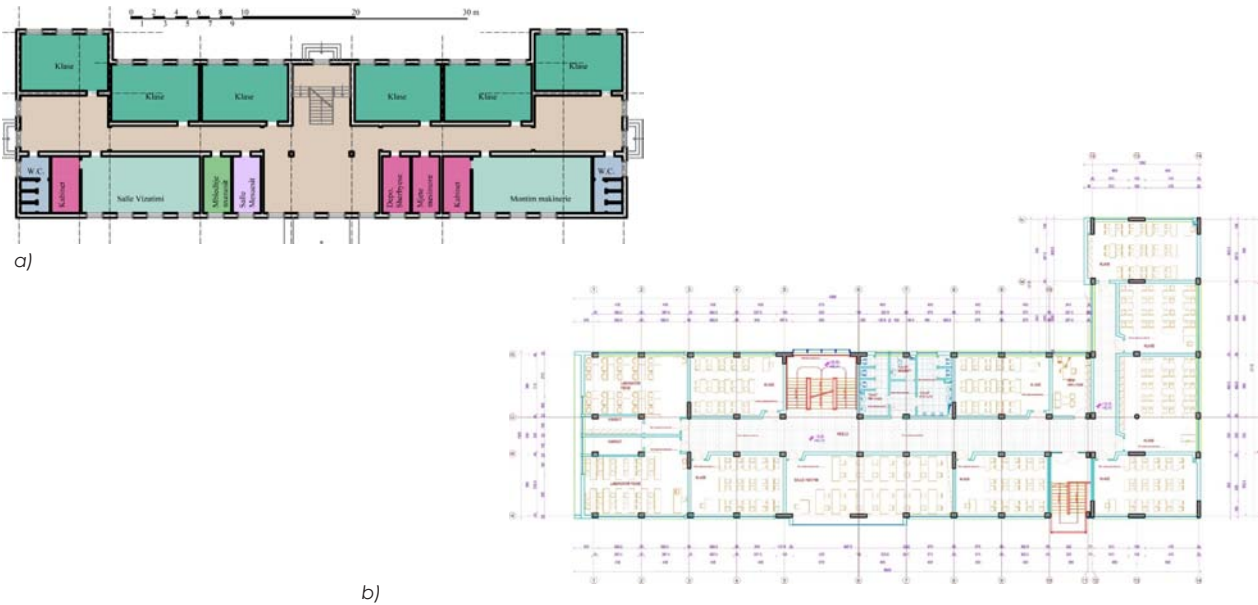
a) Type '59- Ground floor plan of high school type of 1959, b) "Hasan Tahsim school"- 2017, First floor plan, architects Klodiota Ltd.
